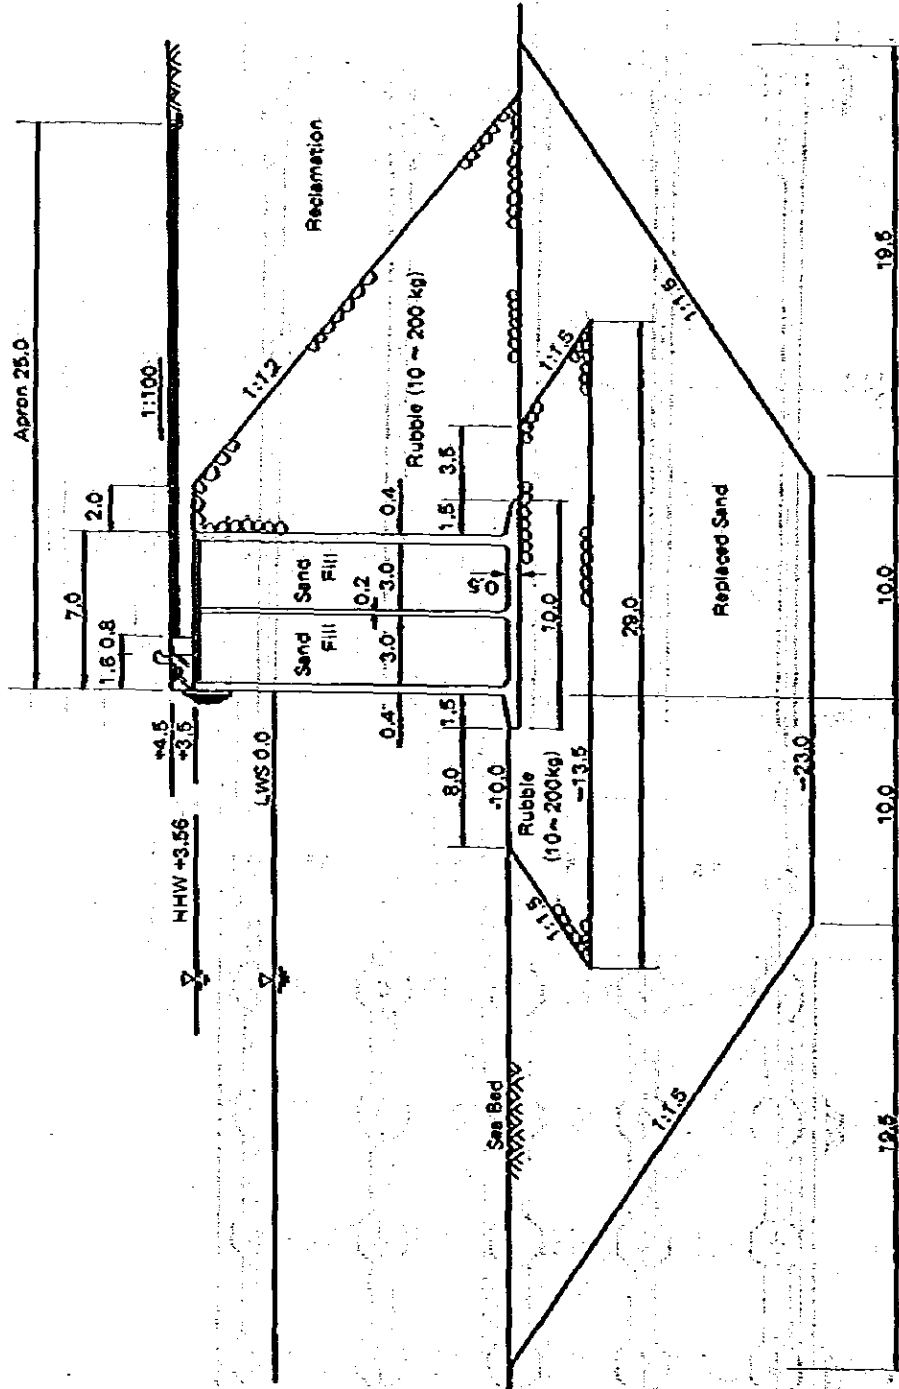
Standard Section of Alternative Plan C (Caisson Type Quaywall)
